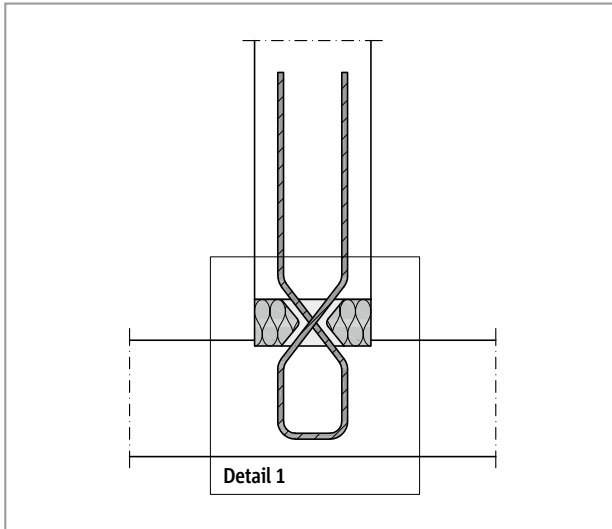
Schöck Sconnex® type W: Tight fit between the upper edge of the floor and the lower edge of the pressure bearing is ensured
